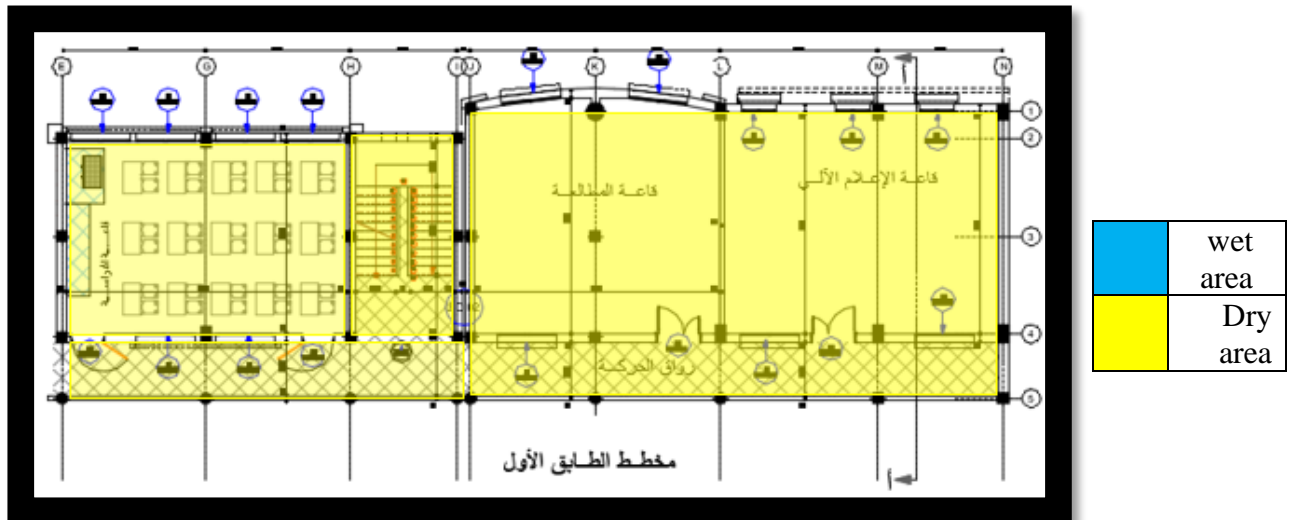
feild feature in the first floor ,Source: first floor plan adapted by the author 2025
